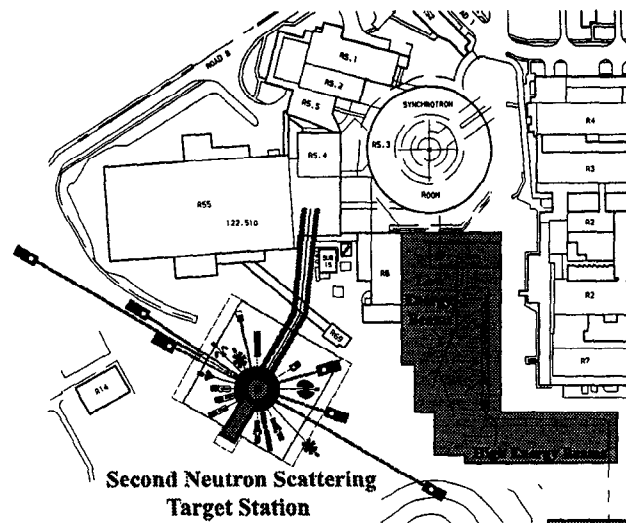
Layout of a second target station and a proposed radioactive beams facility, SIRIUS, at ISIS.
